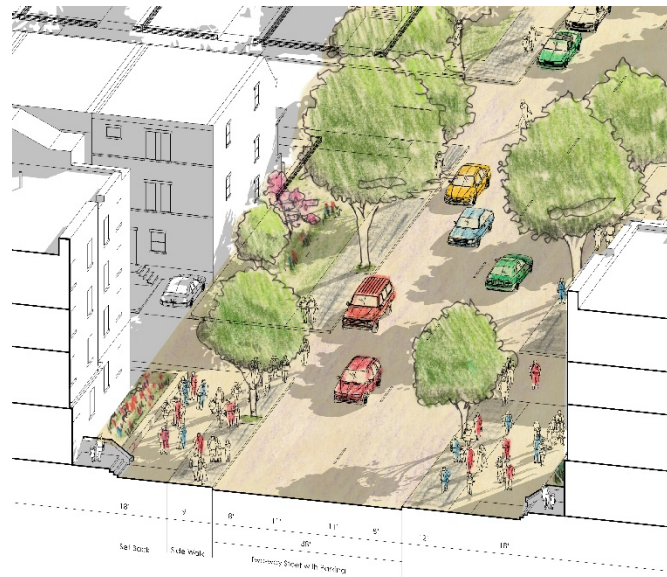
22nd St. NE Section (Source: Christopher Ramirez)
